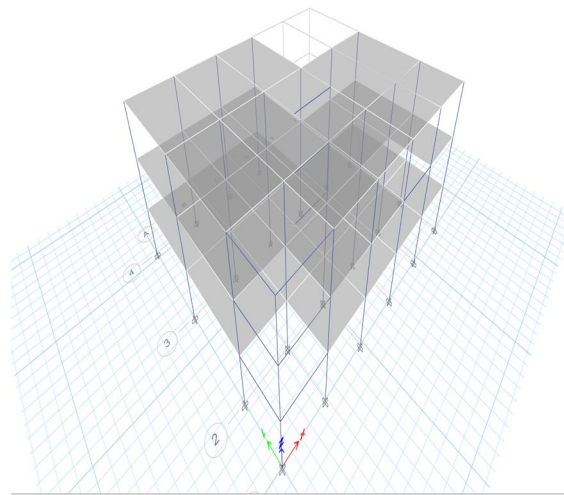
3D Extruded View of the ETABS Structural Model (G+2 Structure)
